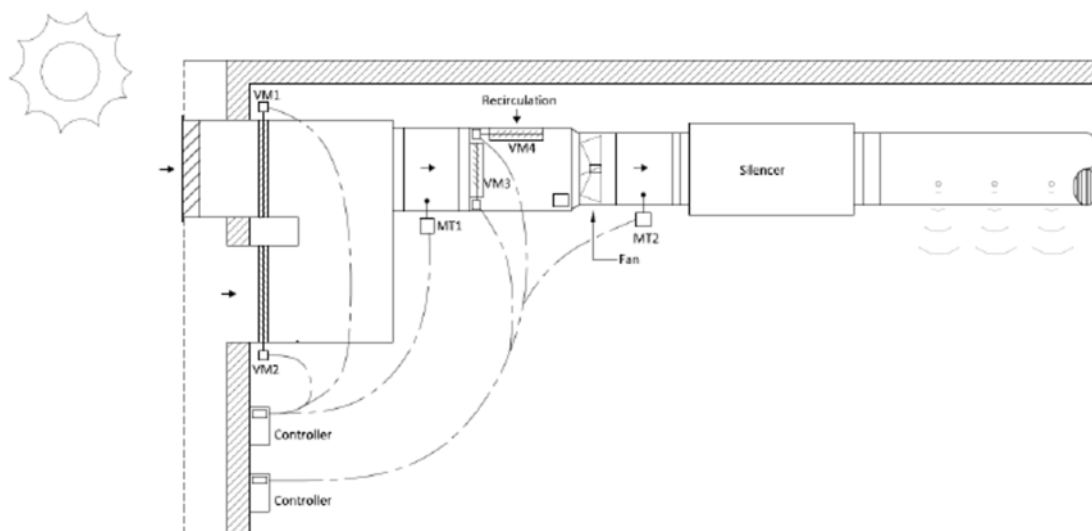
Fan with Bypass Arrangement of Solar Wall
